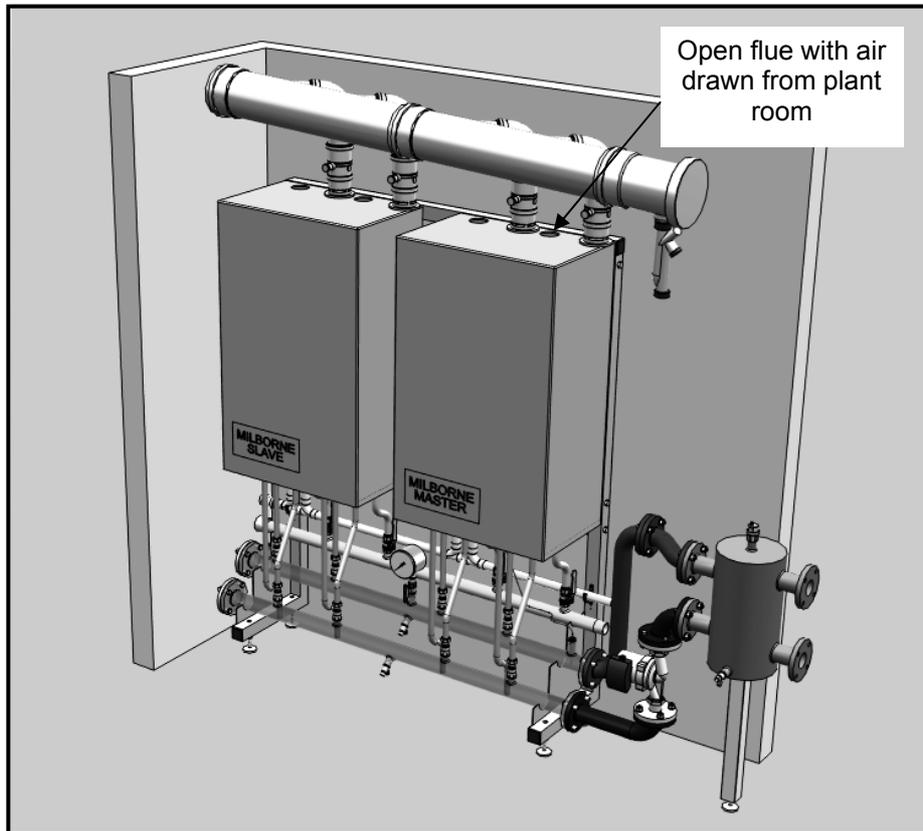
Two boiler arrangement showing frame, flue header, water pipework and primary circuit pump kit
